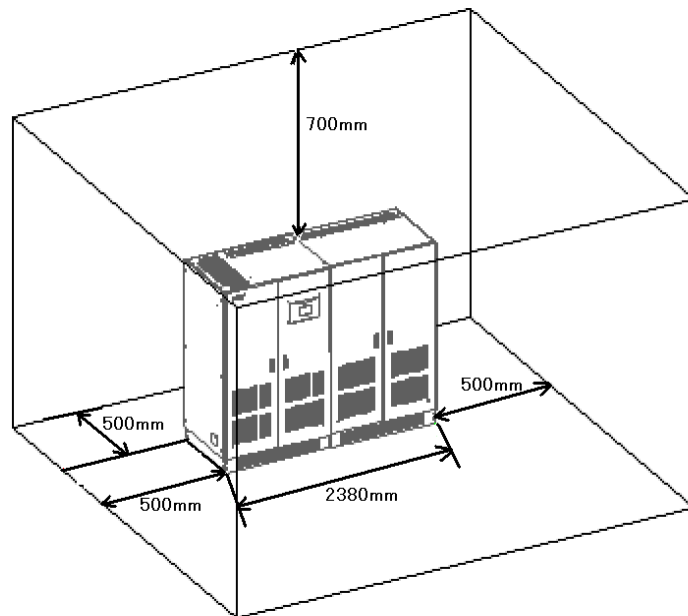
installation space diagram of 400~600KVA UPS (unit: mm)
